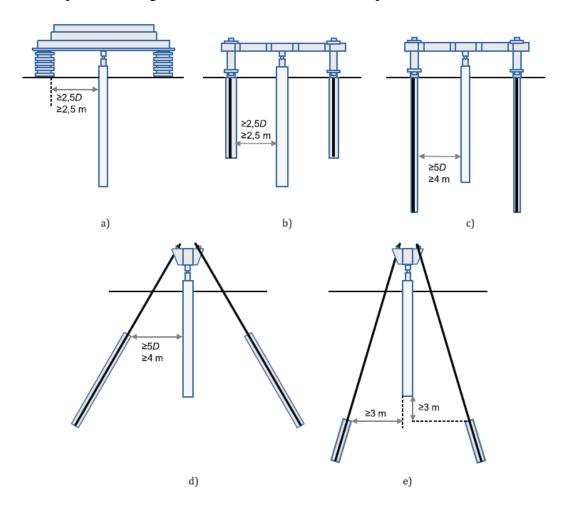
Reaction devices a) dead load b, c) tension piles d, e) anchors [20]
